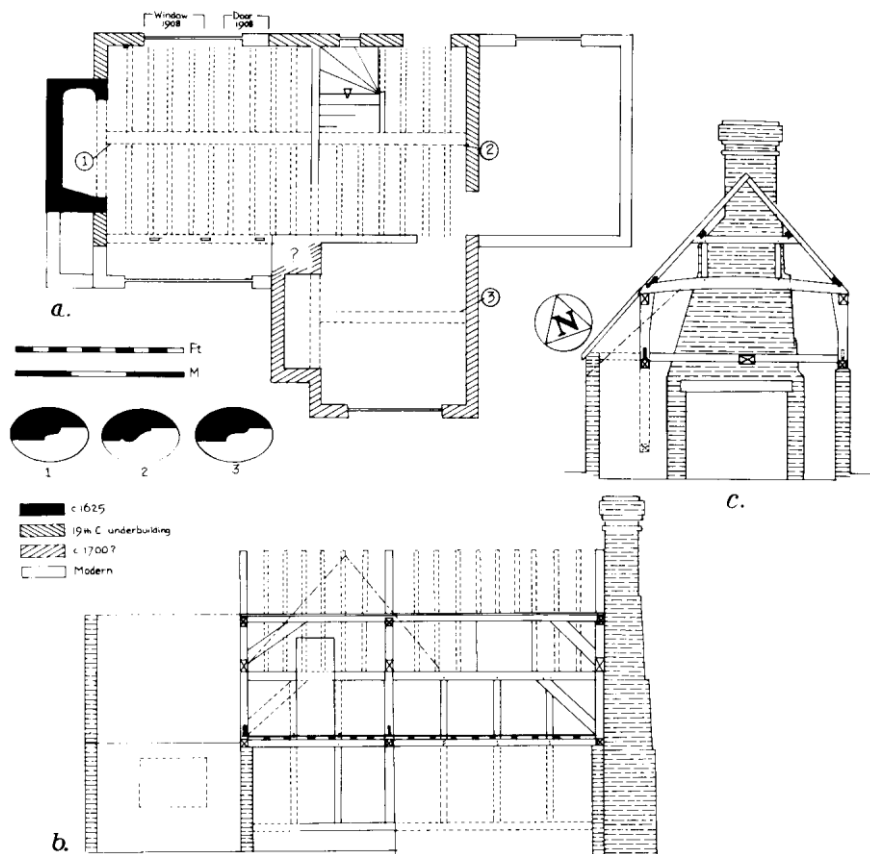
Lawyer's Cottage, (a) Ground plan, (b) Cut-away view, looking south, (c) Section at A-A, looking west.
